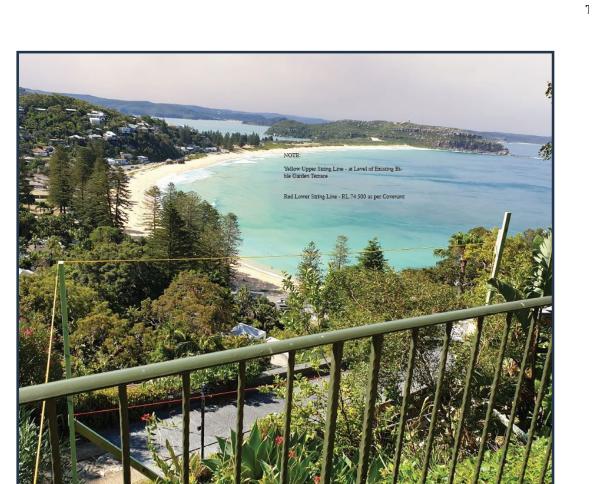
Site photo detailing the installation of the height poles in relation to the existing view (Source: Stephen Lesiuk Architect)
